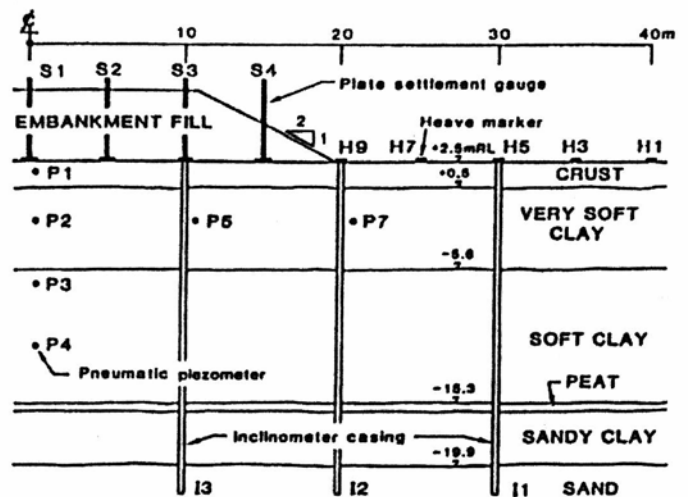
Cross section of Muar clay test embankment showing field instrumentation
